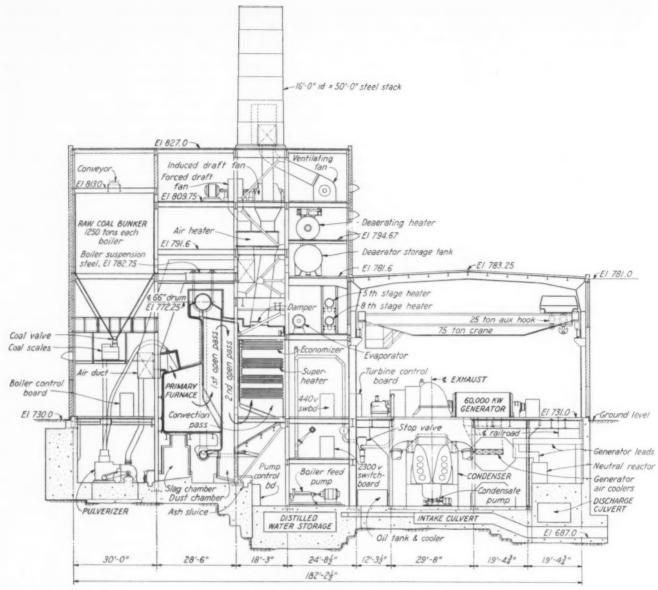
CROSS SECTION OF WATTS BAR STEAM PLANT
